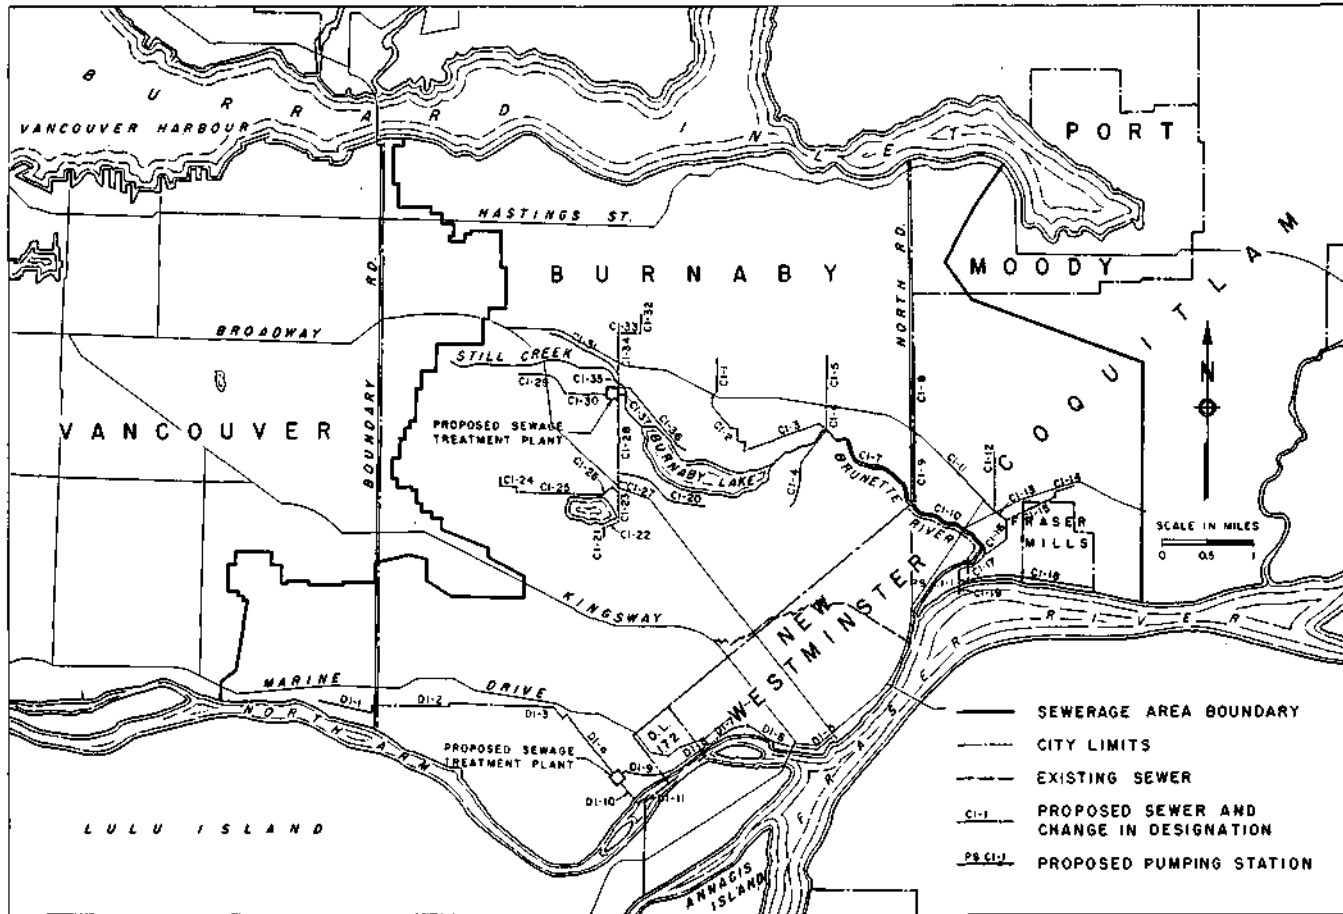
Proposed Layouts of Plan C1 and Plan D1 - Fraser Sewerage Area
